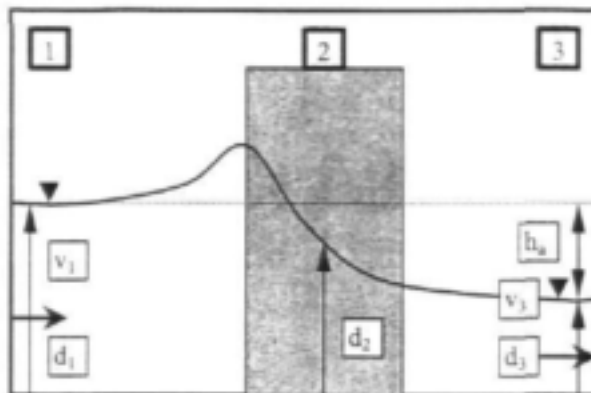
Longitudinal section of a bridge pier under high discharges
